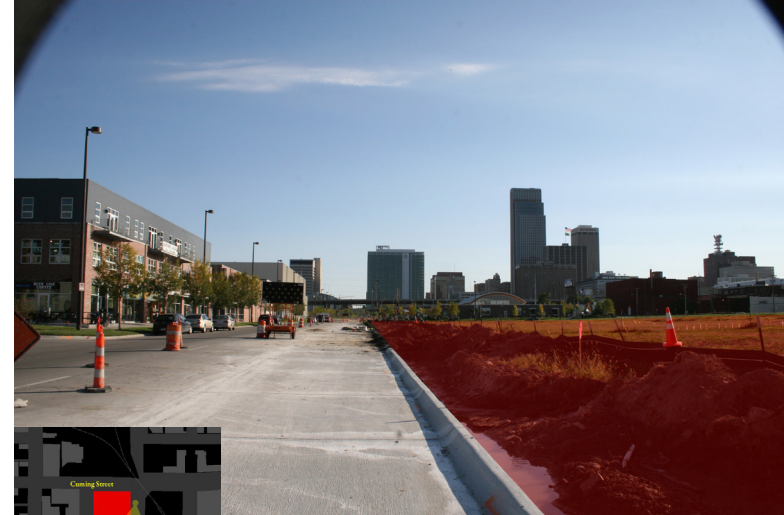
Site Photo - Looking South from 14th and Cuming Street
